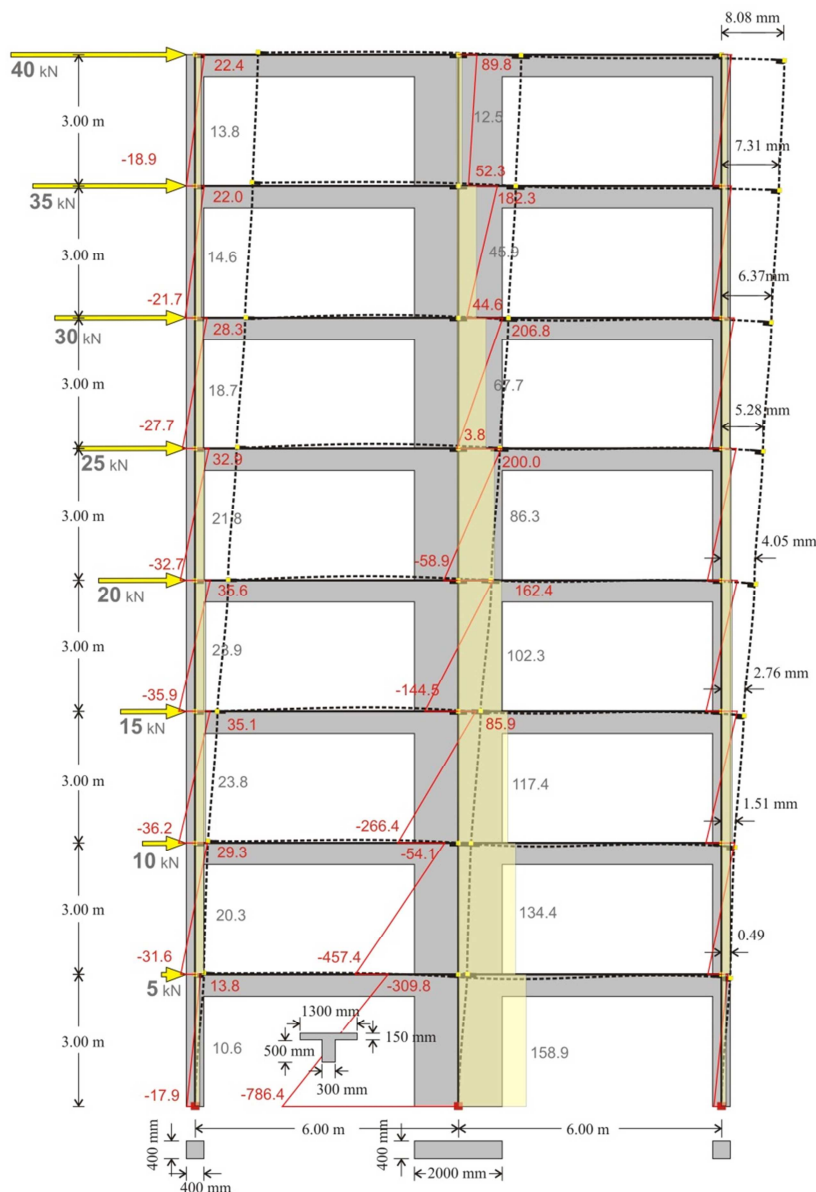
DUAL type structure comprising two columns and one wall with cross-sections 400/400 and 2000/300 respectively.
